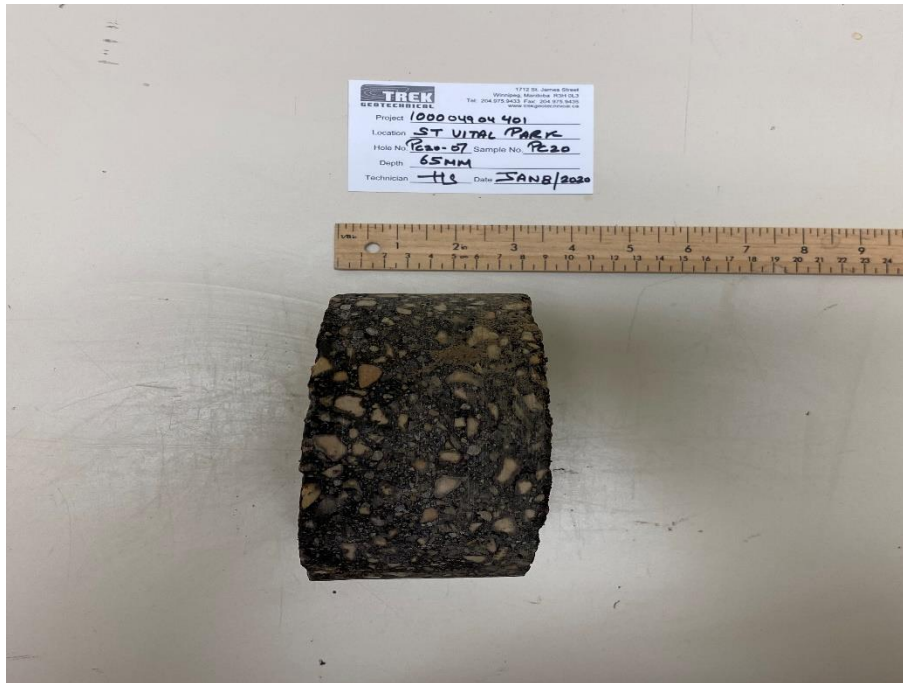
Pavement Core Sample at Pavement Hole PC20-07
